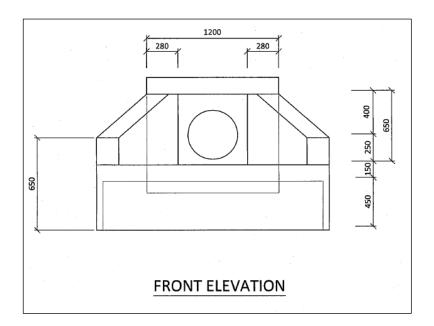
Typical Concrete Headwall Detail (Front Elevation)
